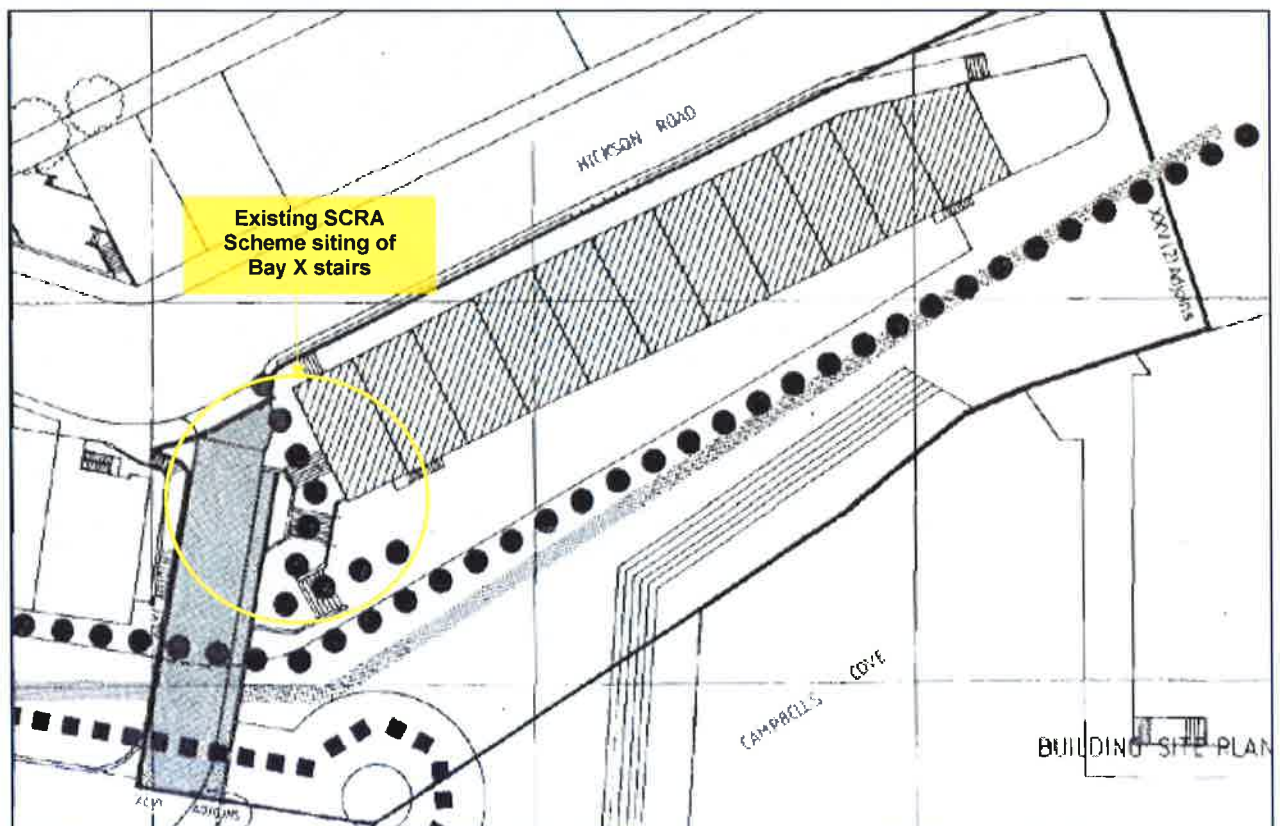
Existing SCRA Scheme Drawing (Source: Applicant's EIS)
